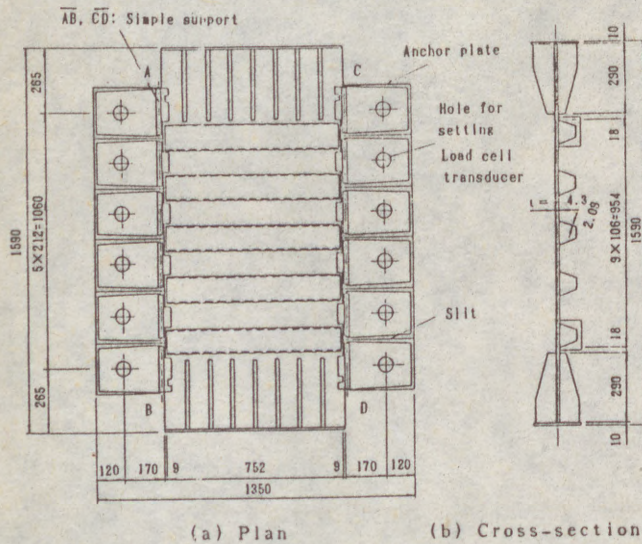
Stiffened Plate Specimen No. TCT (dimensions in mm)
